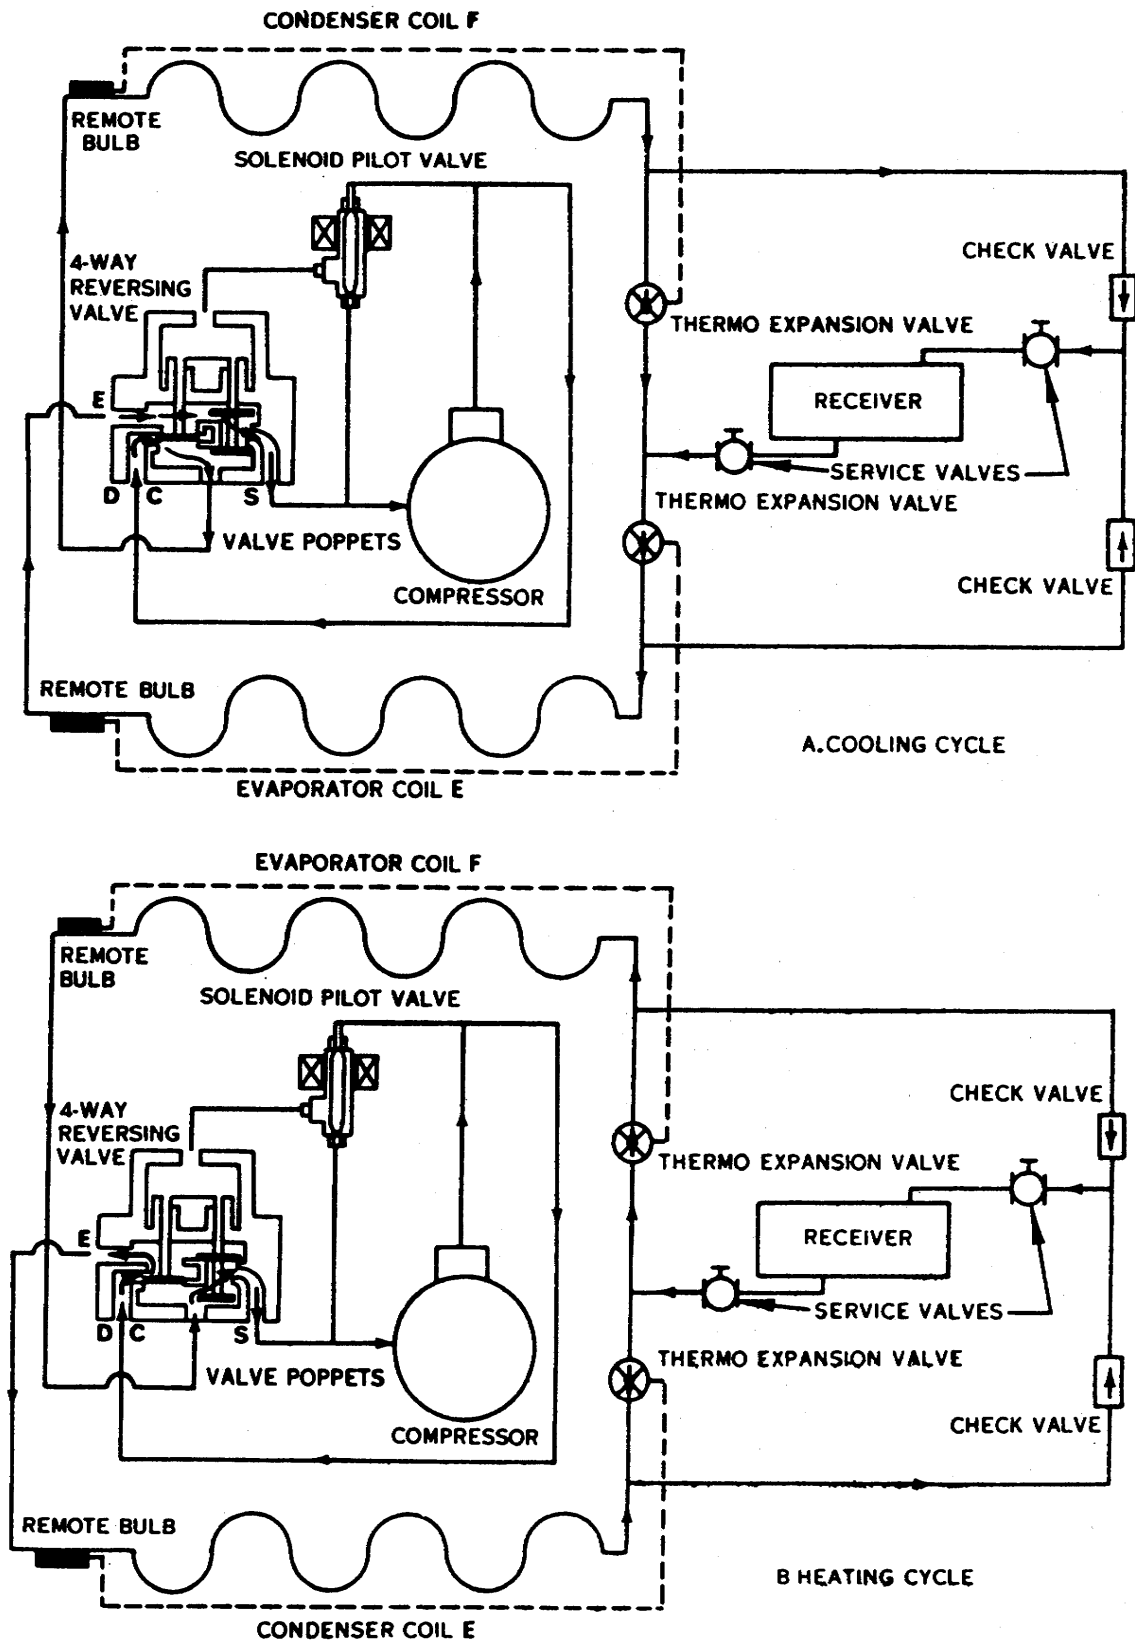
Heat pump system with 4-way reversing valve, solenoid pilot 3-way valve, two thermostatic expansion valves, and two check valves.
